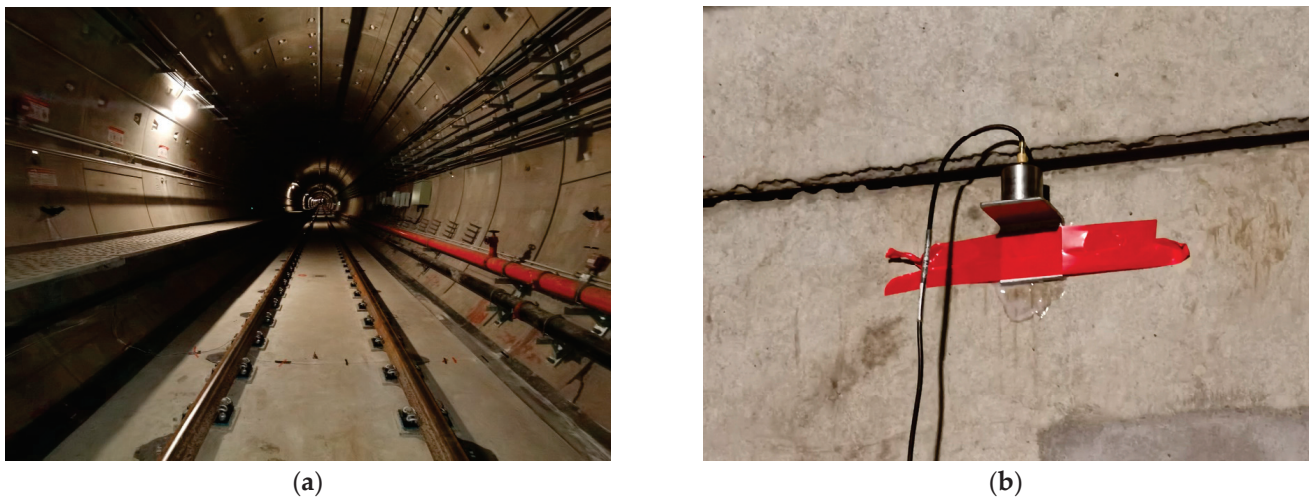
Test photos: (a) a test section; (b) an accelerometer installed on the tunnel wall.
